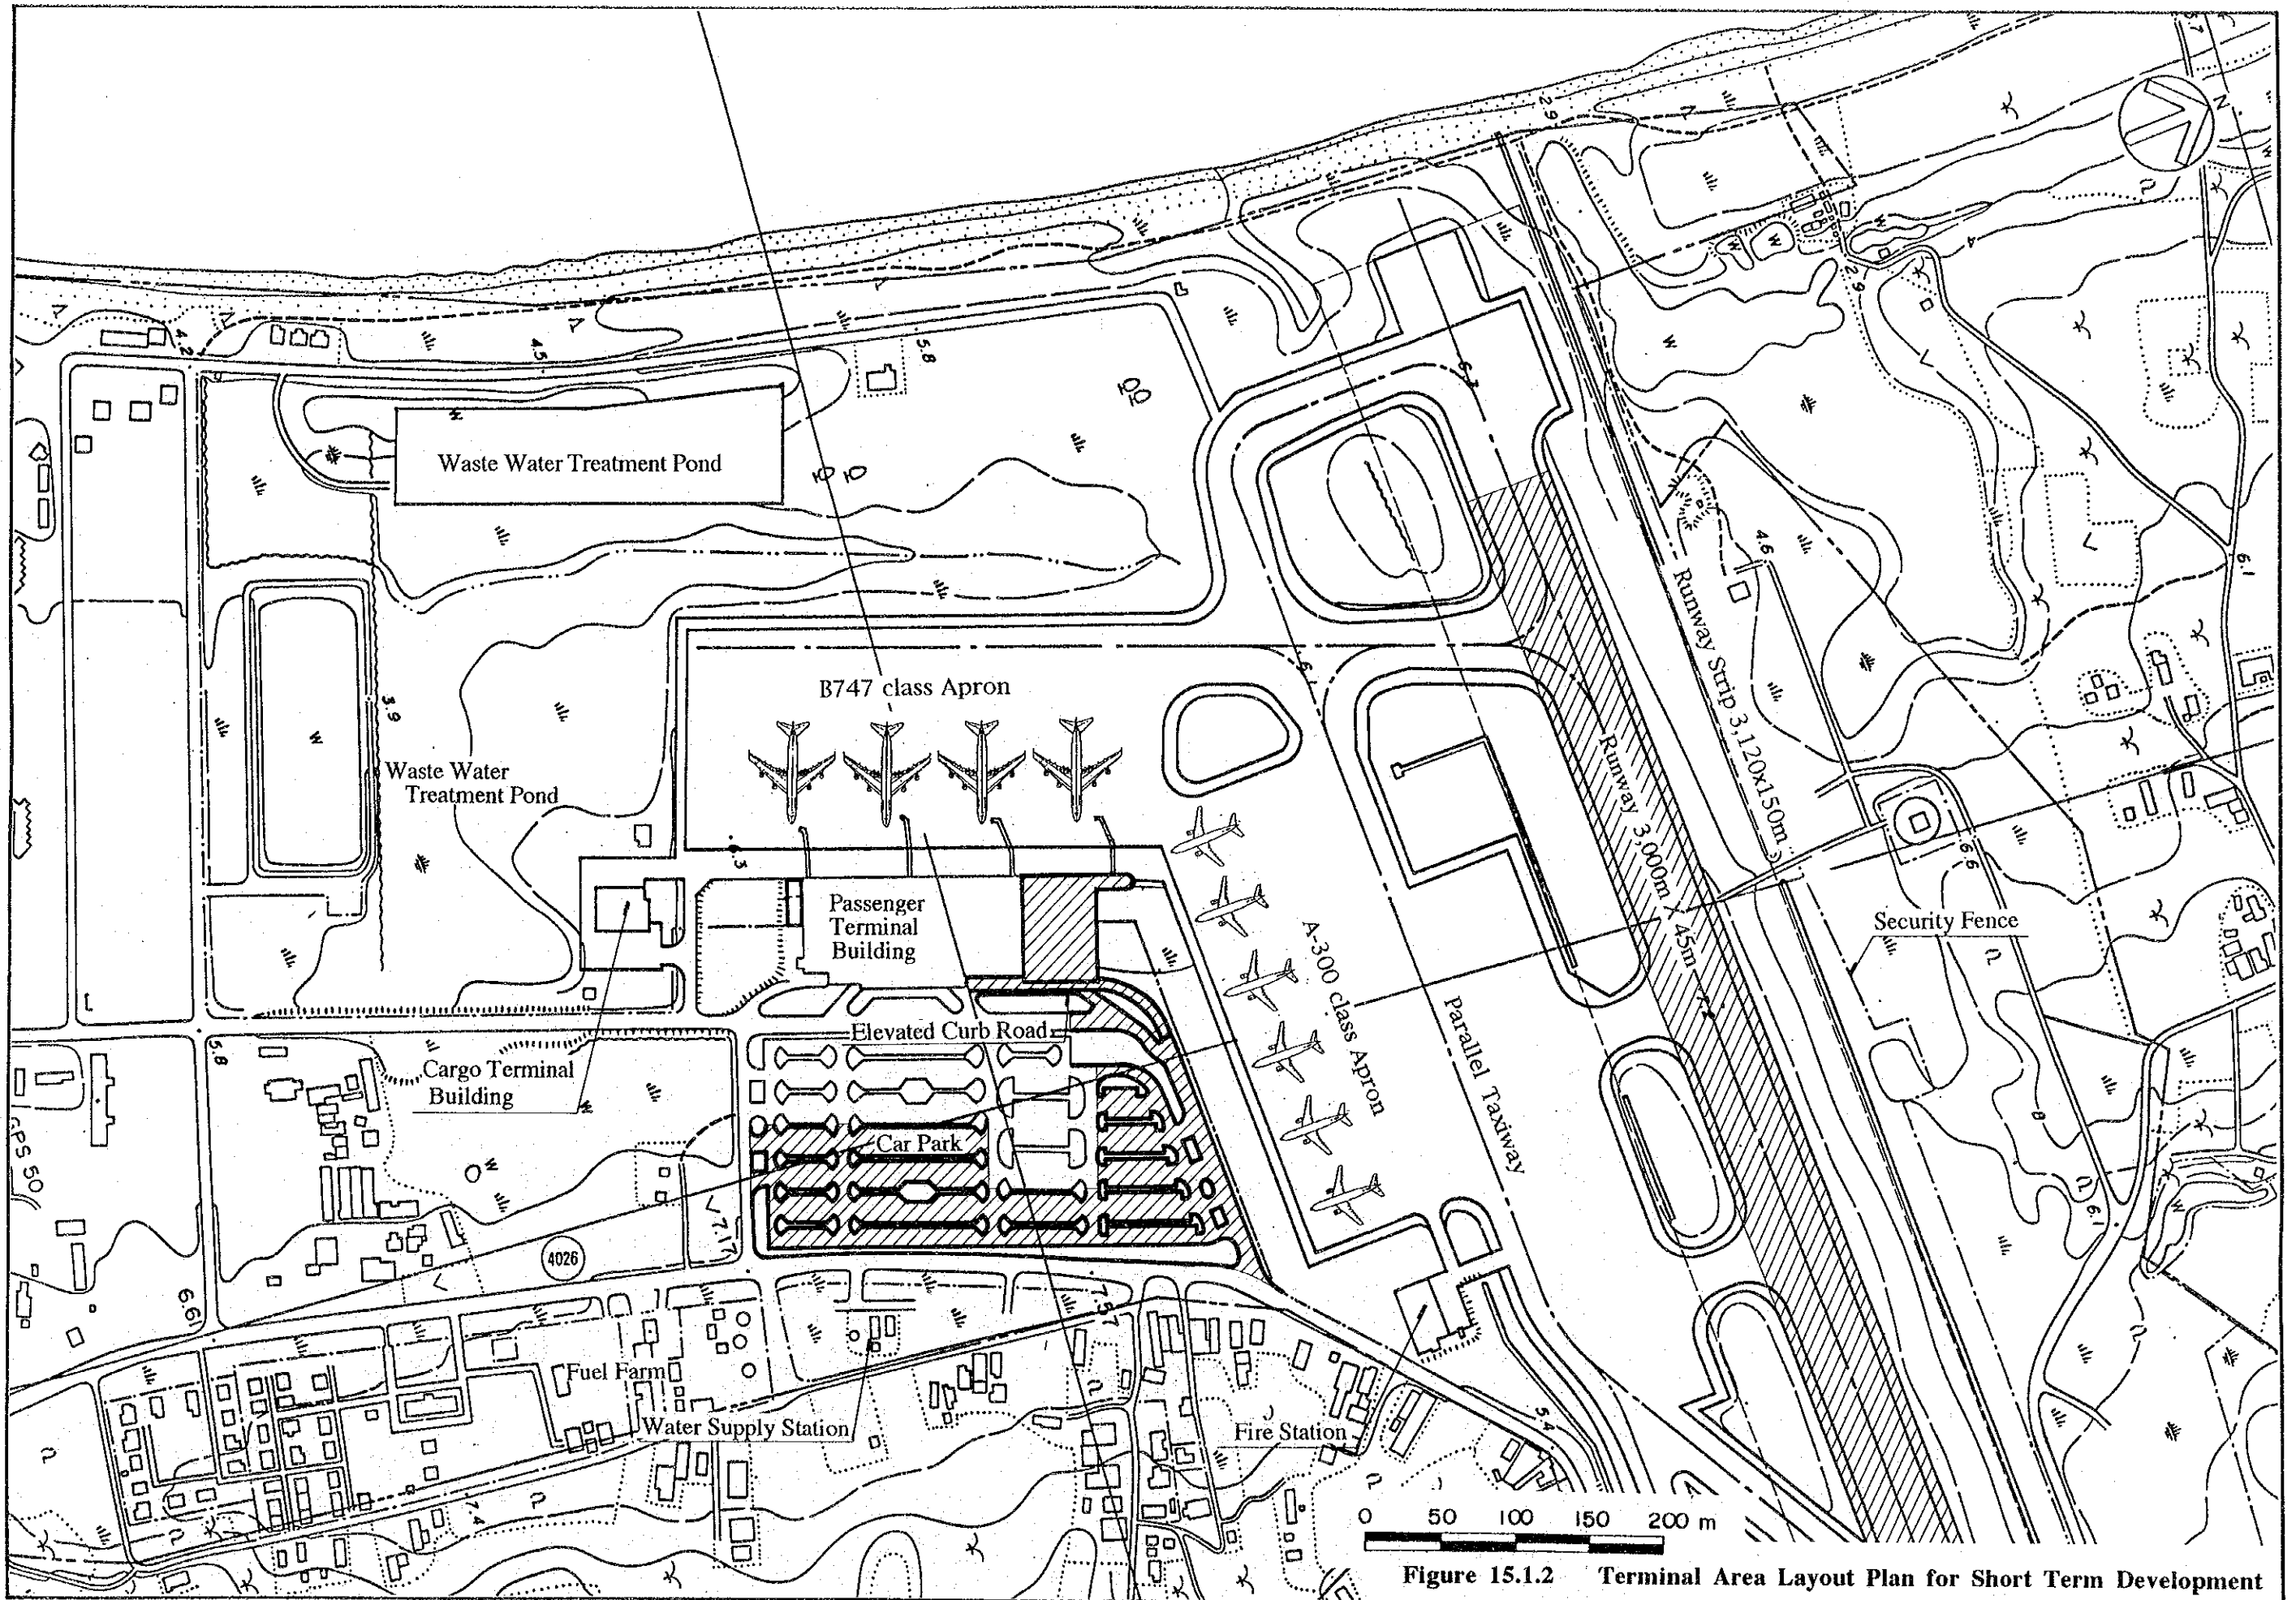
Terminal Area Layout Plan for Short Term Development
